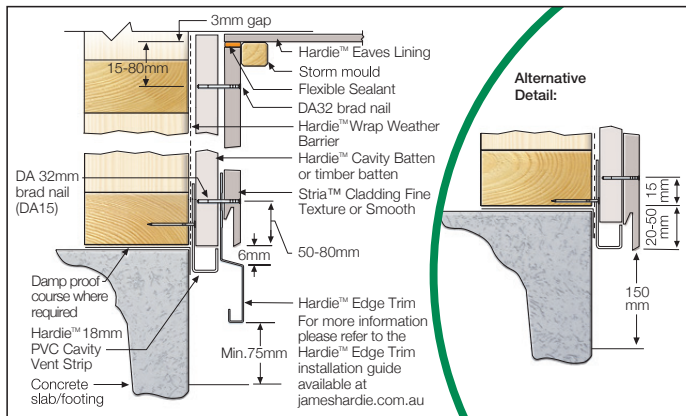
SLAB/EAVE JUNCTION DETAIL
